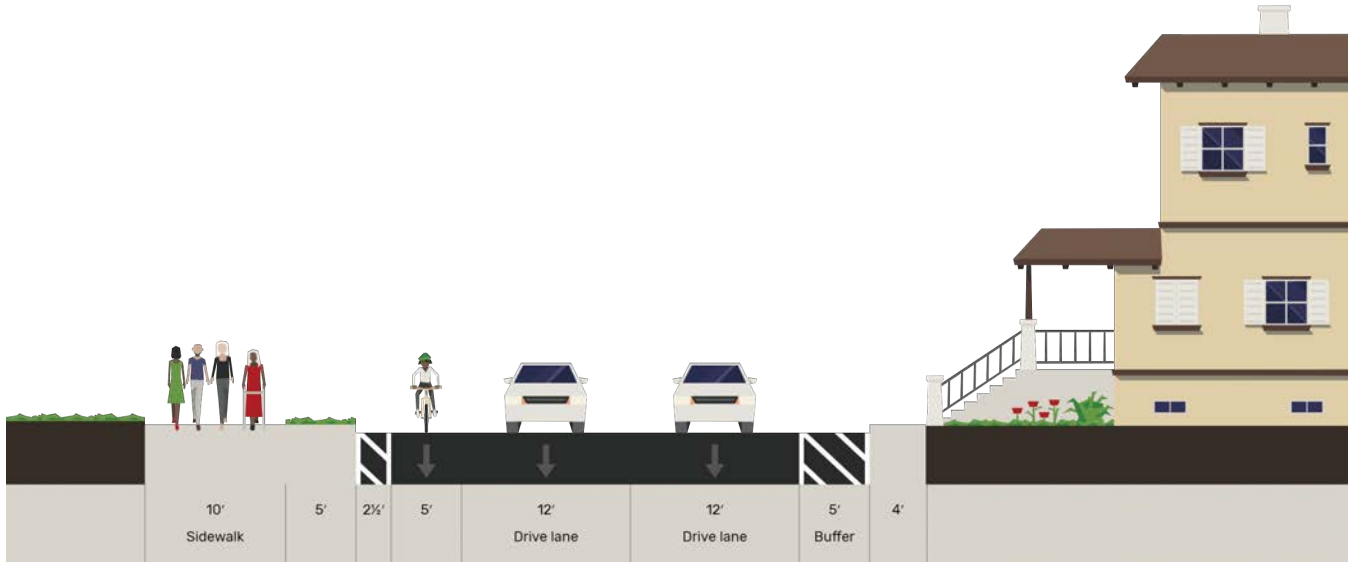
Existing Section on Michigan Street with Proposed Sidewalk (Looking East)
